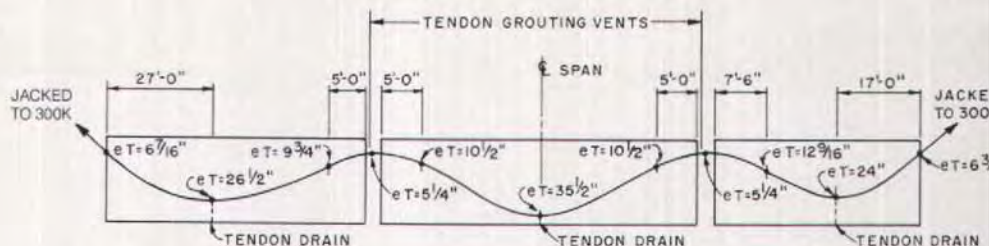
The selected tendon pattern maintained compression at the top of the exposed slab and cast-in-place cross beams while reducing the load carried by the existing interior piers.
